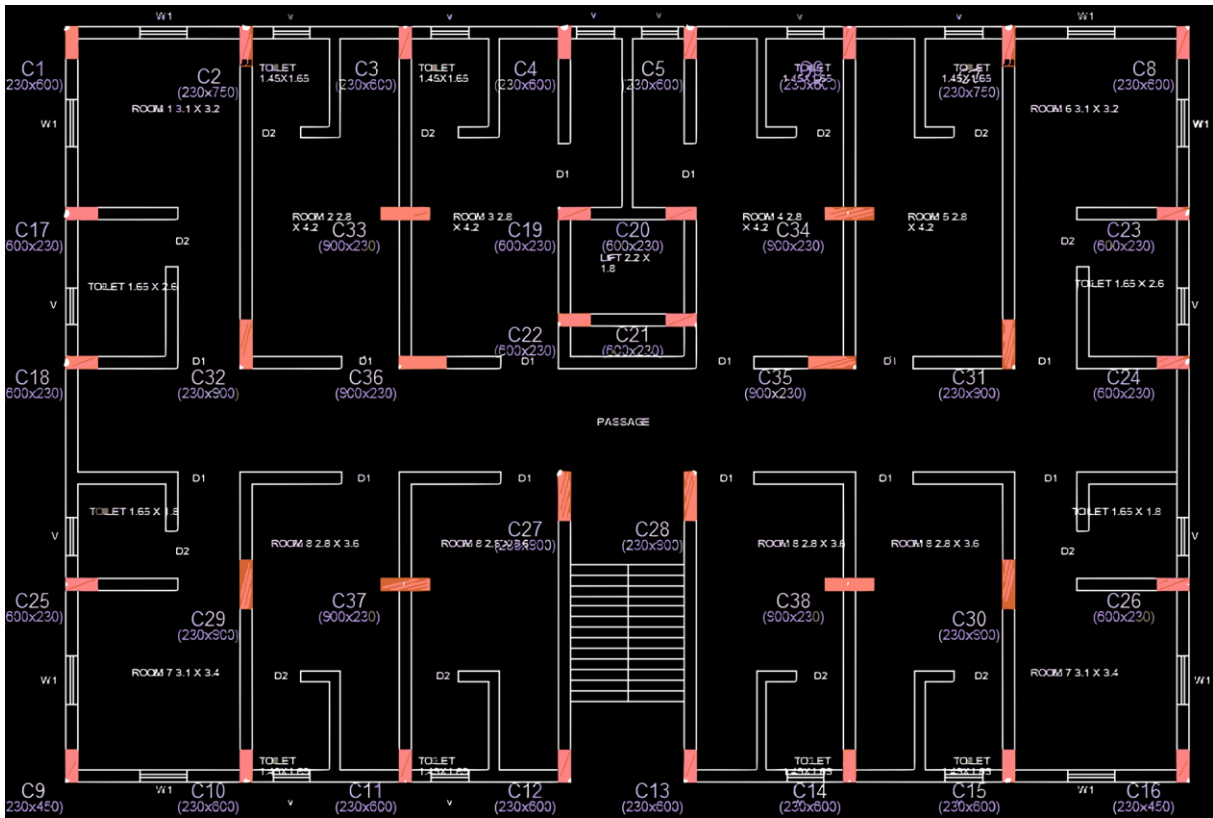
Plan of Case E3 (Steel Fe-415, Concrete – M30)
